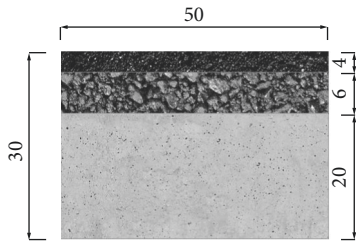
Cross-sectional view of an asphalt concrete specimen (cm).
